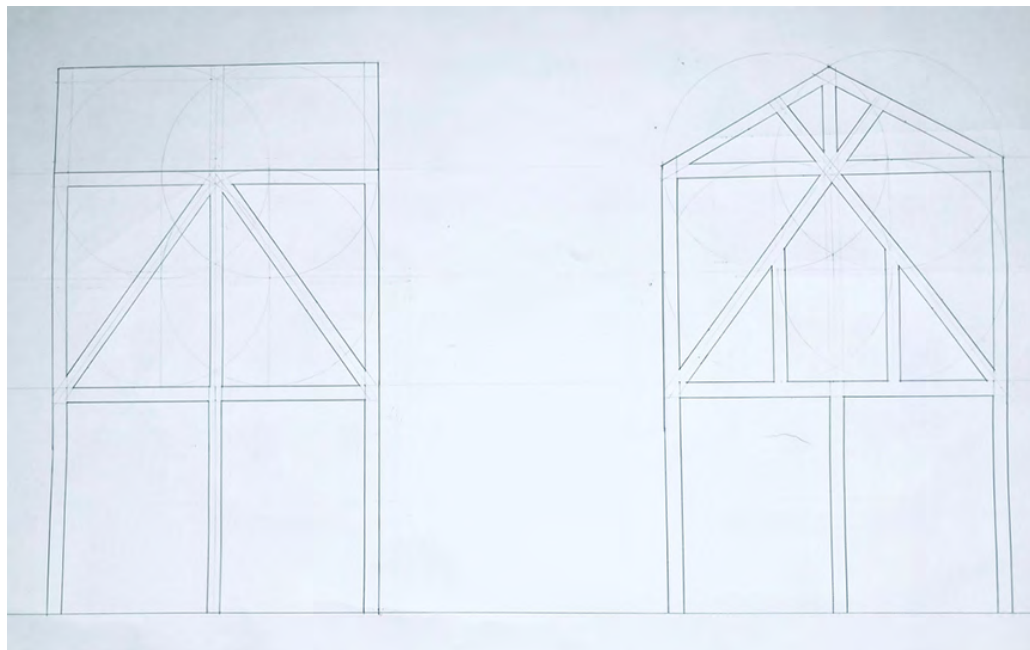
Light Timber Construction uses structural members measuring 3.5 inches by 3.5 inches and 5.5 inches by 5.5 inches in an X-bracing pattern to transfer wind loads to the ground.
